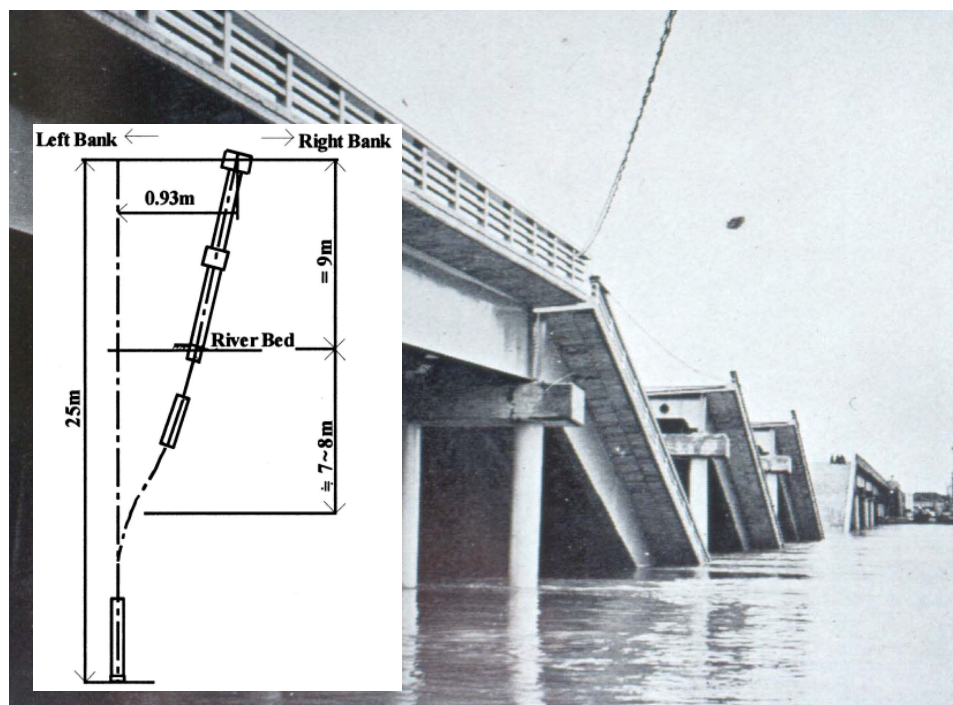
Damage to steel piles of Showa Bridge (PWRI; From Yasuda and Berrill 2000).
